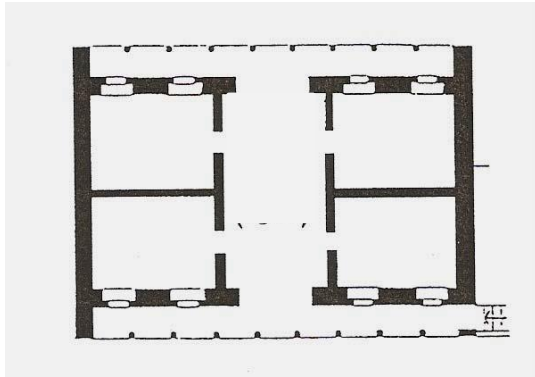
Liwan house plan (Mahmoud, 2008).
